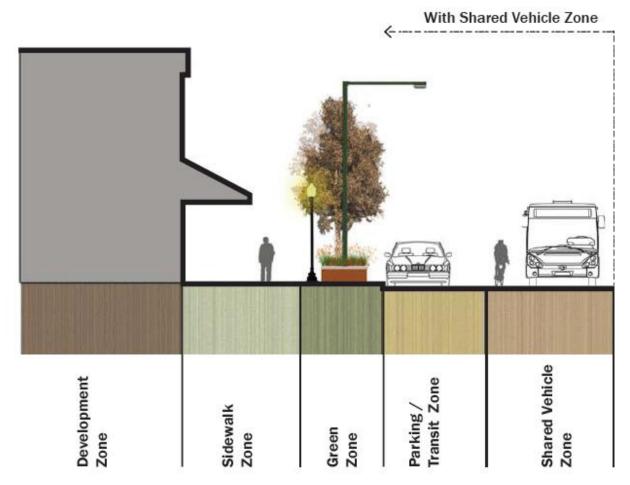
Rural Village Main Street Illustrative Street Cross-Section from NCDOT's Complete Streets Planning and Design Guidelines
